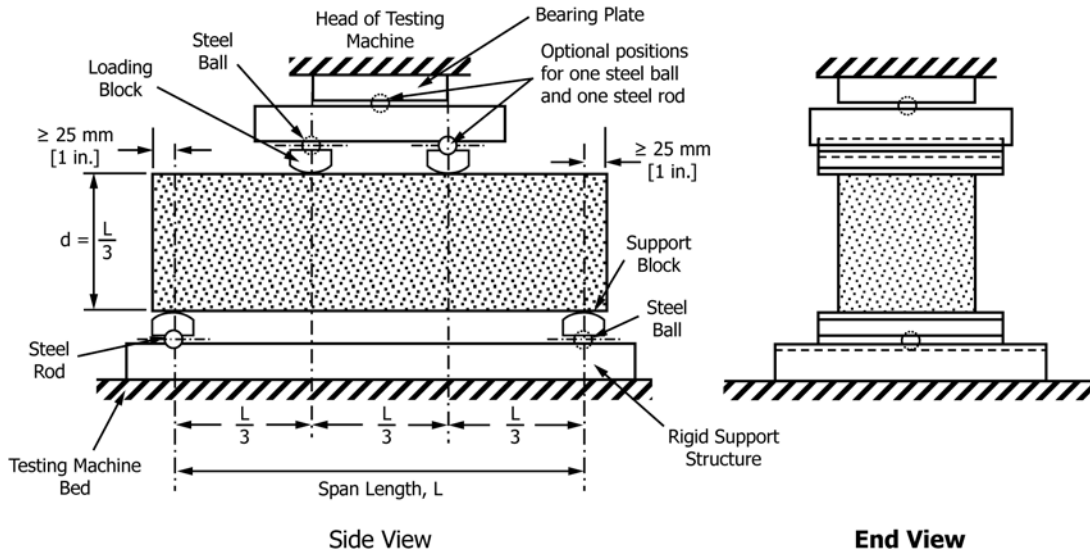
Schematic of Flexural Testing Apparatus for Third-Point Loading Method
